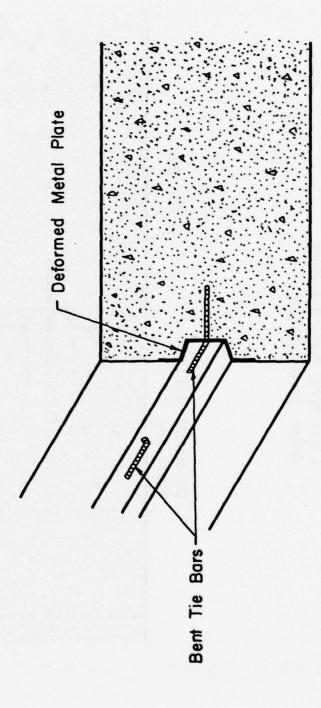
Current Procedure for installation of tie bars in keyed pavements.
